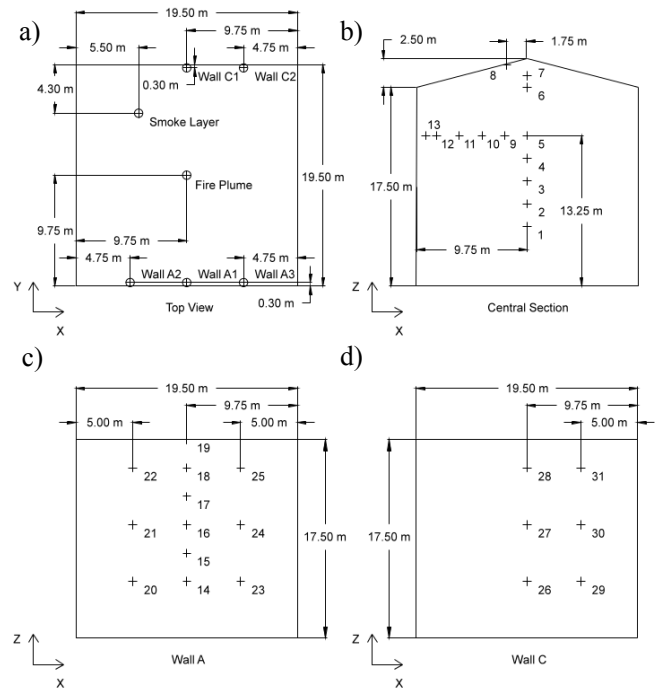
Sensors layout on the atrium: thermocouple trees location, central section (b), at 30 cm from wall A, and at 30 cm from wall C.
